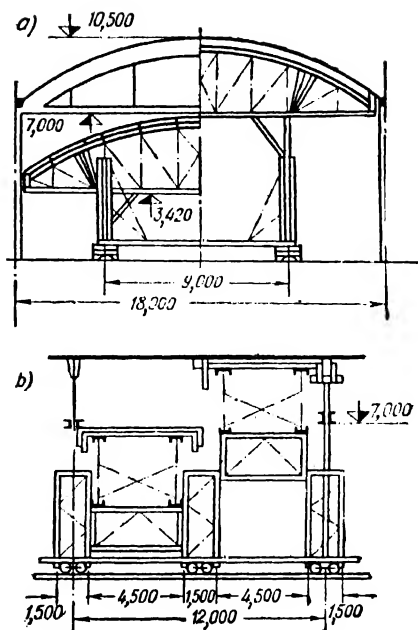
Travelling formwork for the construction of in-situ reinforced concrete buildings
